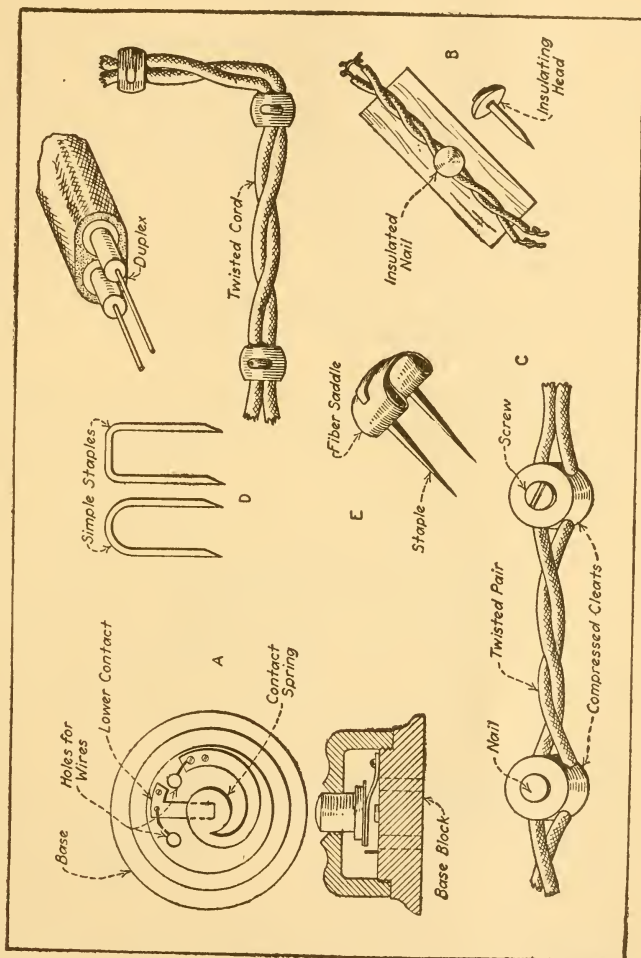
Push Button Switch Construction Shown at A. Wiring and Staples for Holding It in Place Shown in Other Drawings.
